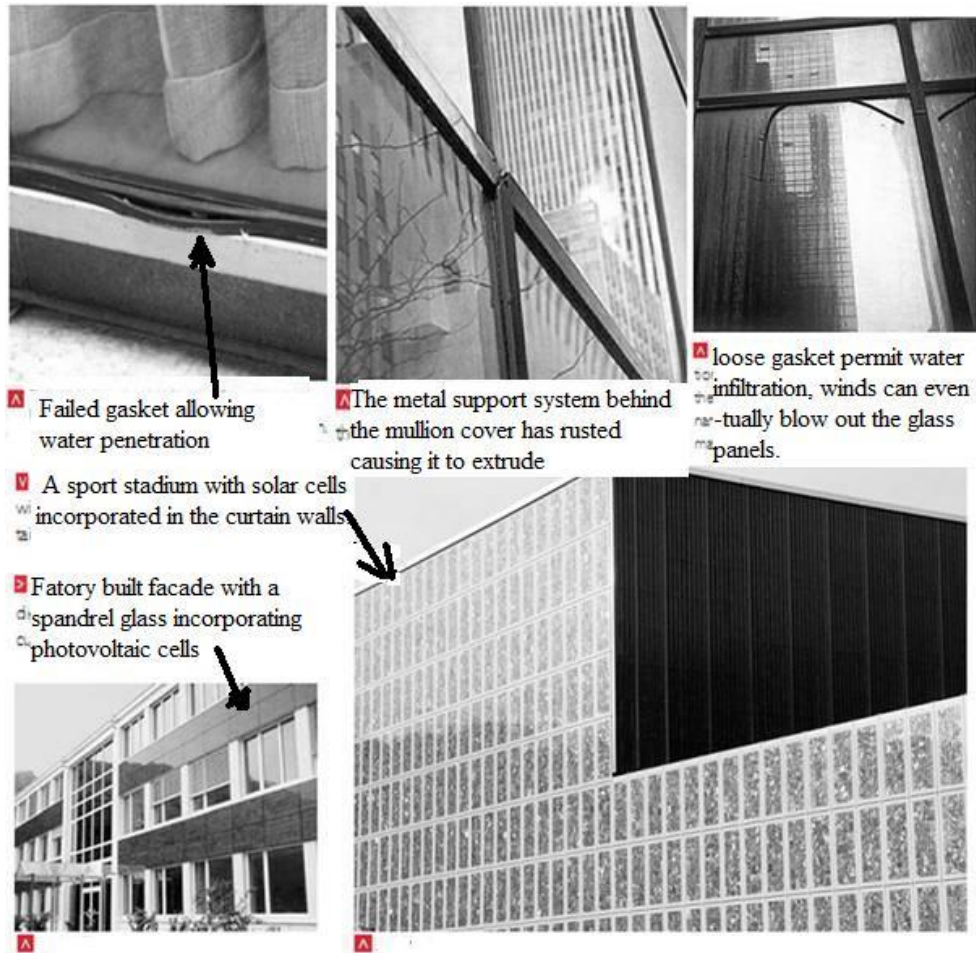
Curtain Wall Details (Ilhan and Aygün, 2006)
